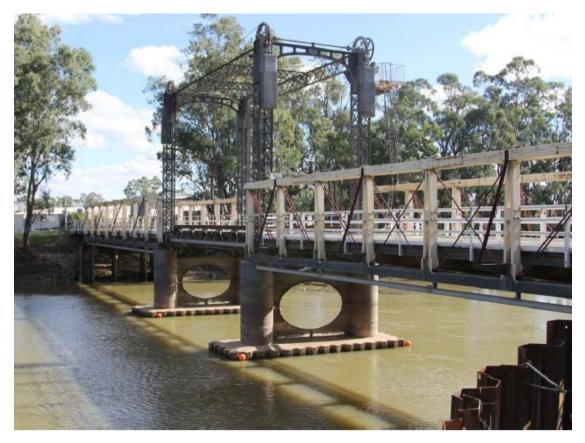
Barham Bridge looking south west, showing deterioration of the pier webbing on both river piers (Source: Roads and Maritime)
